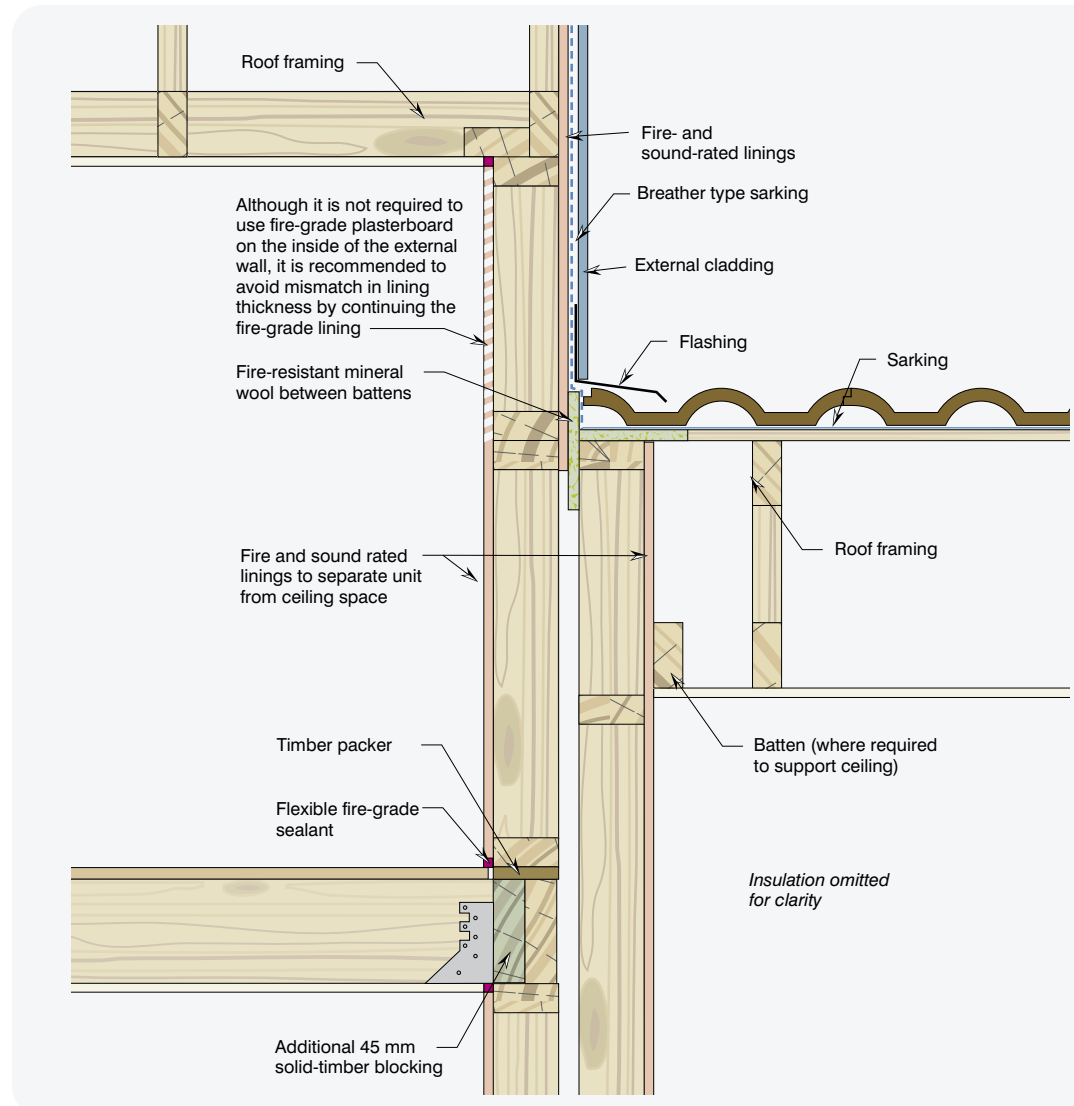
Staggered roof lines meeting at a separating wall – elevation view.
